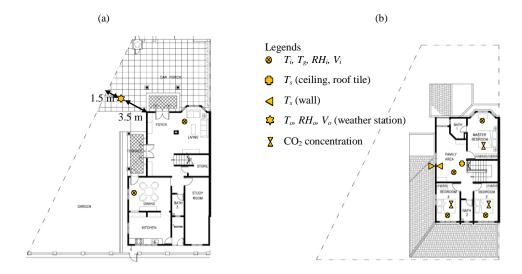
Measurement locations in the investigated house: a) ground floor and b) first floor.
